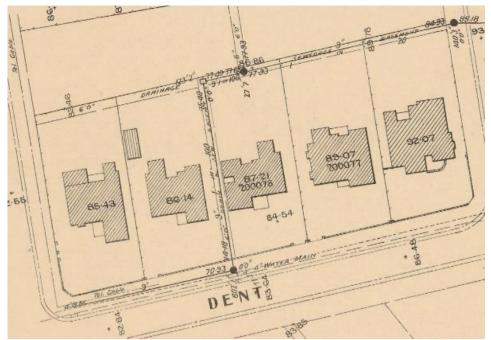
Detail of the previous figure showing five houses constructed by 1937 at 20 to 28 Dent Street.
